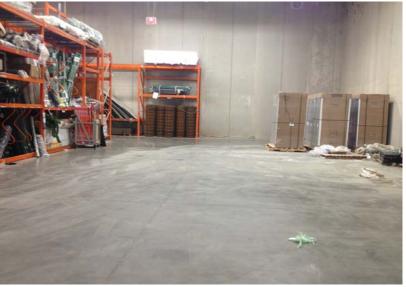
A view of the concrete building slab on the southern side of the building. View is to the south.
